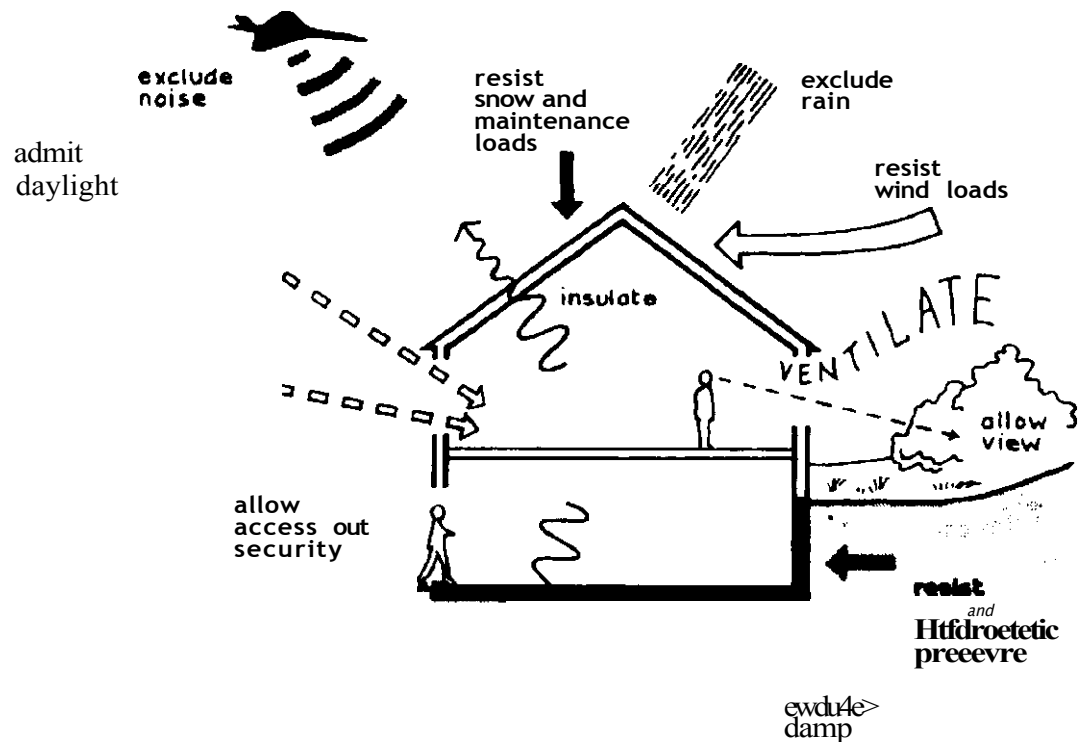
The building envelope is comprised of the roof and exterior walls, windows and doors
